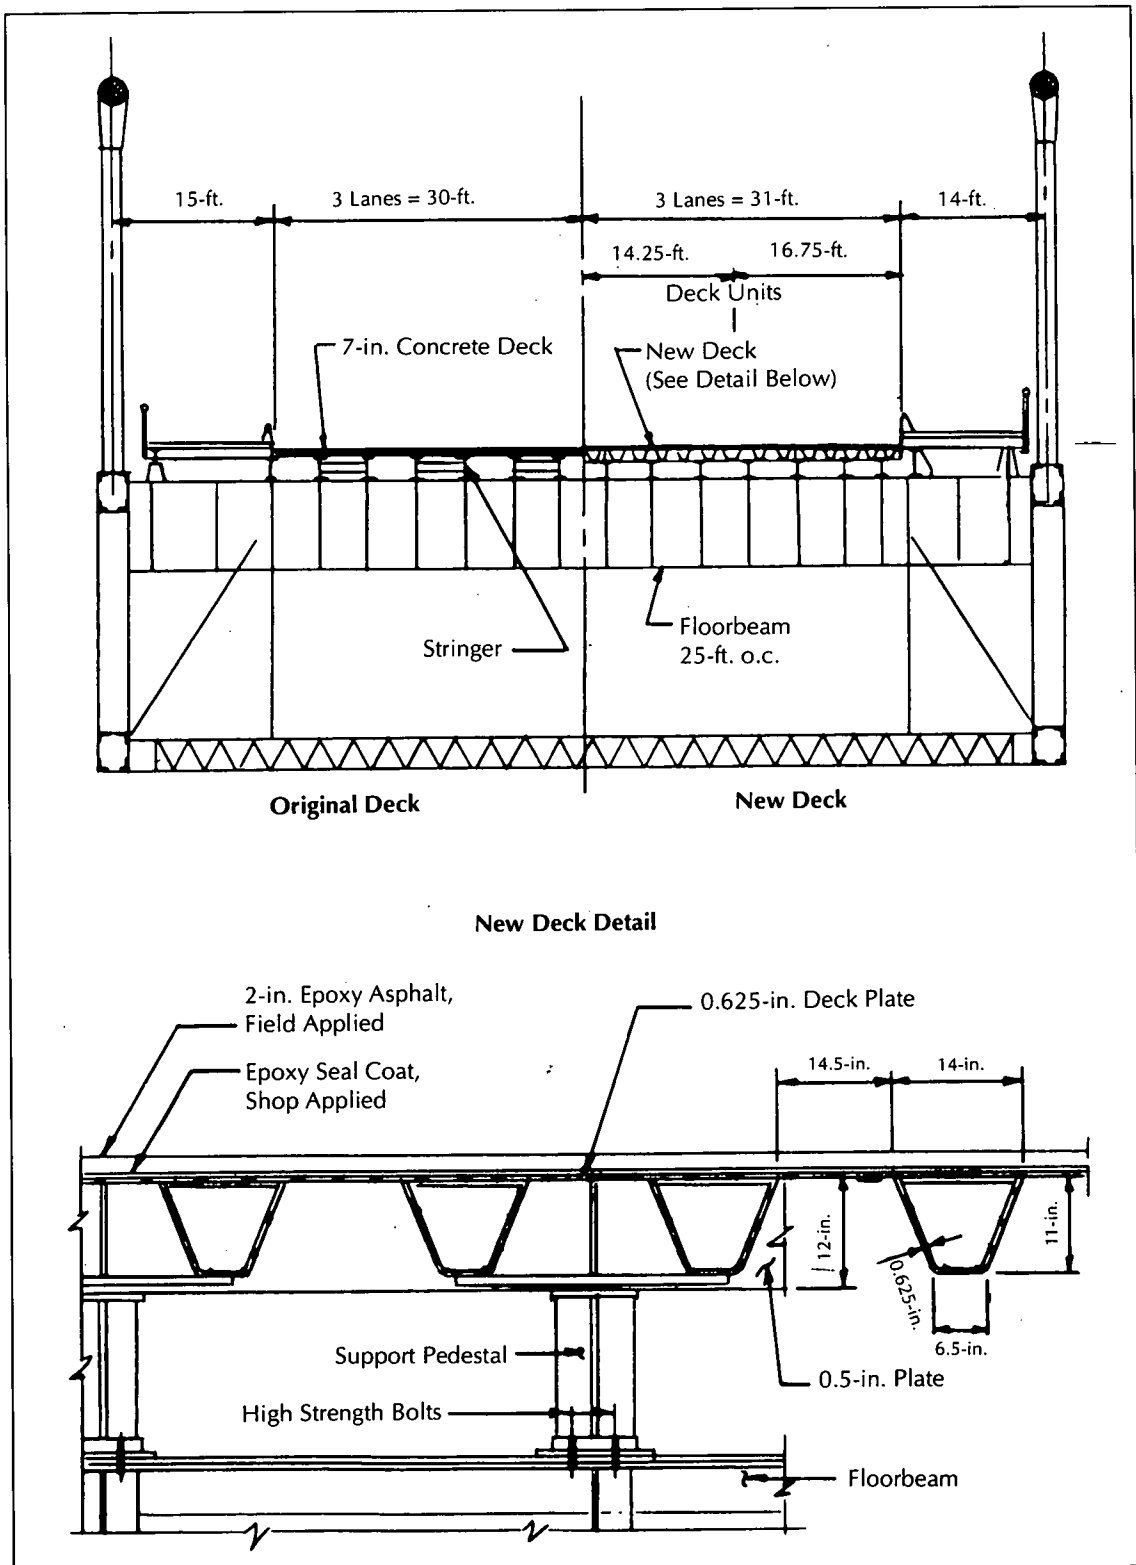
The orthotropic steel deck for the Golden Gate Bridge.
